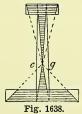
Finding Centre of Gravity of Girder with Taper Web. Fig. 1638.—Finding Moment of Inertia of Girder.
